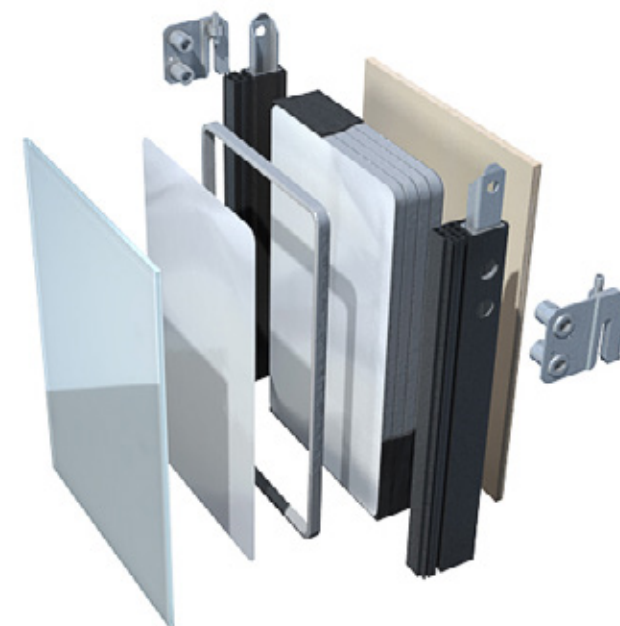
Digital model of the layered construction of an opaque panel in QbissAir façade system
